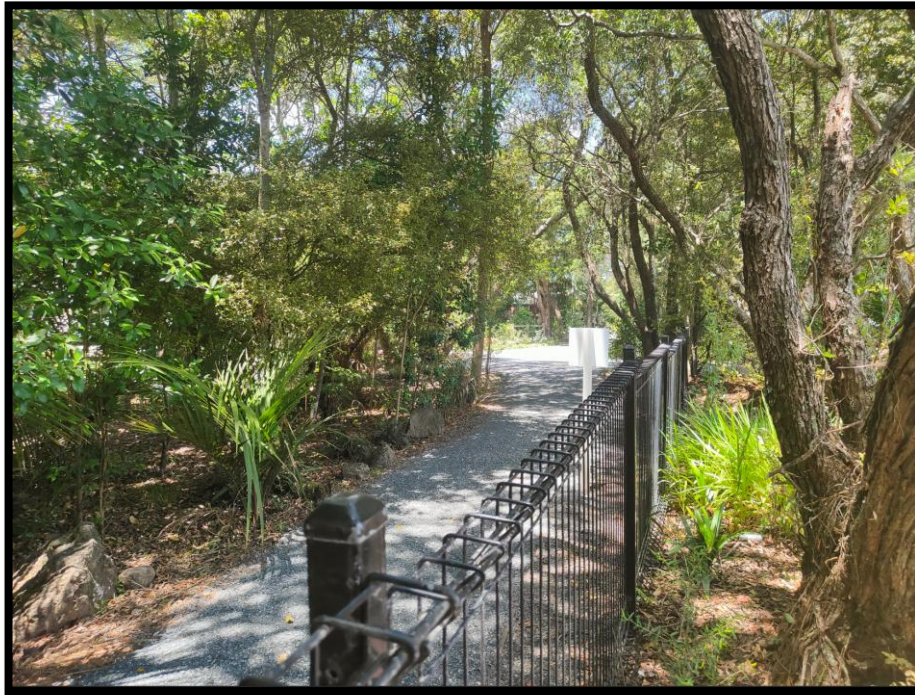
Shelter location to be located behind existing Pohutukawa trees and above the existing pathway to the Waitangi Treaty Grounds toilet facilities
